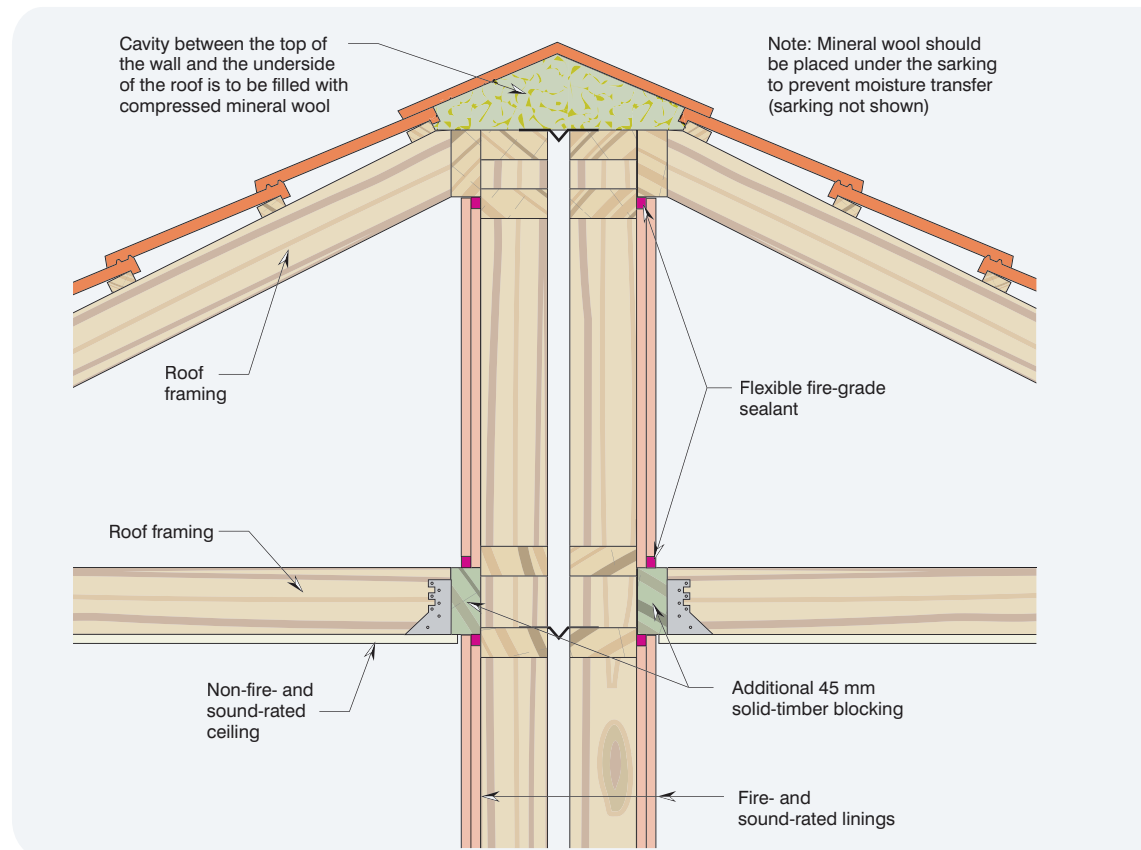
Timber blocks used to maintain fire-resistance – FRL 60 minutes in roof void – elevation view.
